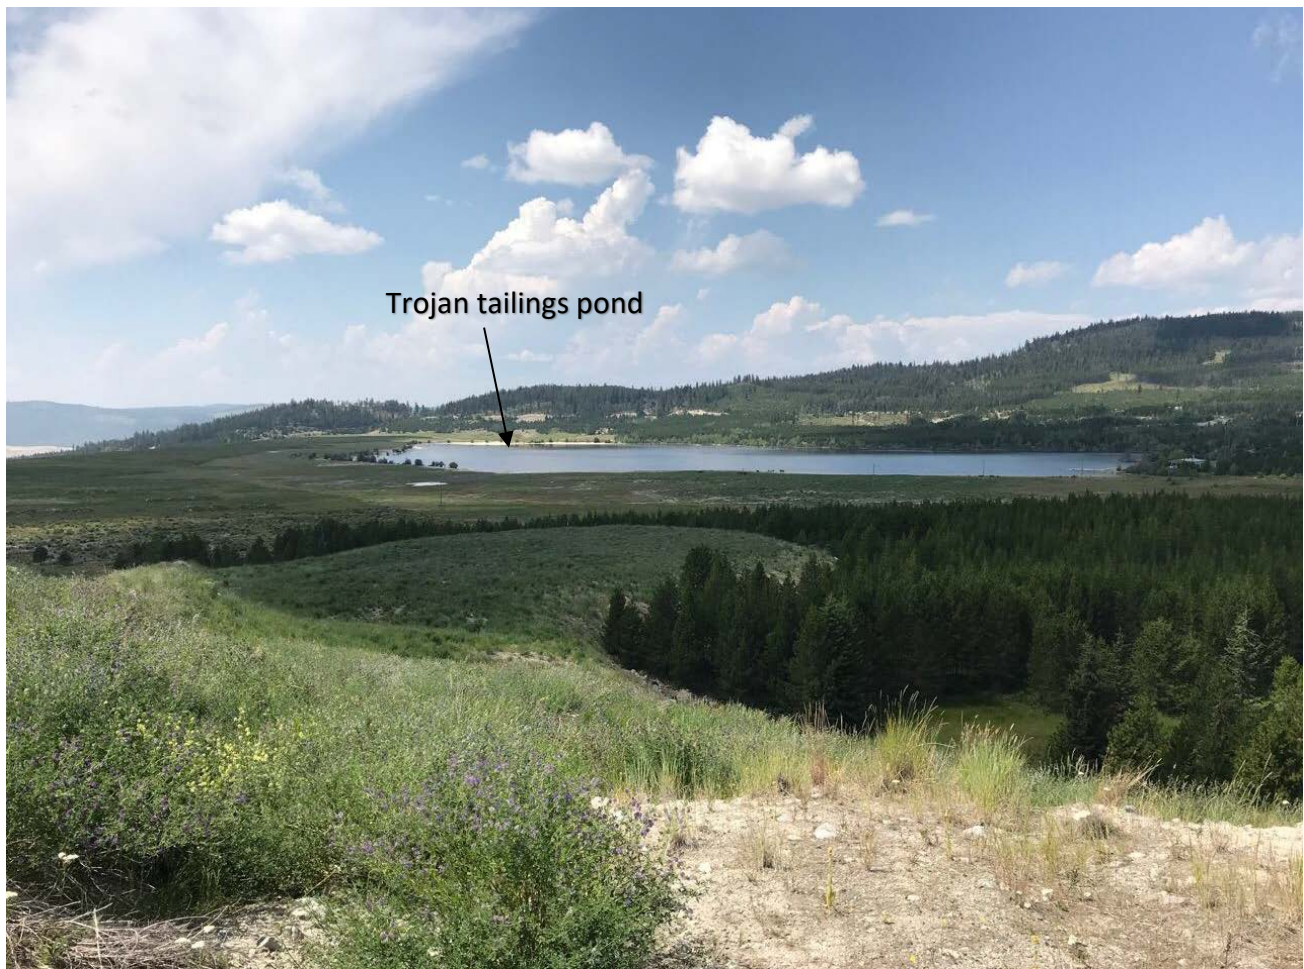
Trojan impoundment view from crest road (TRJ-2018-02)
